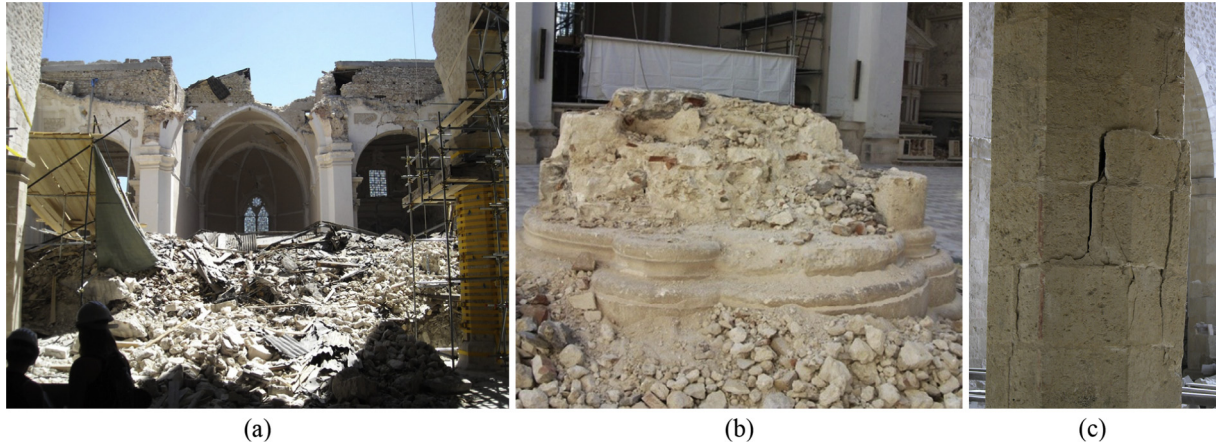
(a) Collapse of the transept area, (b) one of the two main pillars with weak filling material in the core, and (c) cracks on one stone column.
